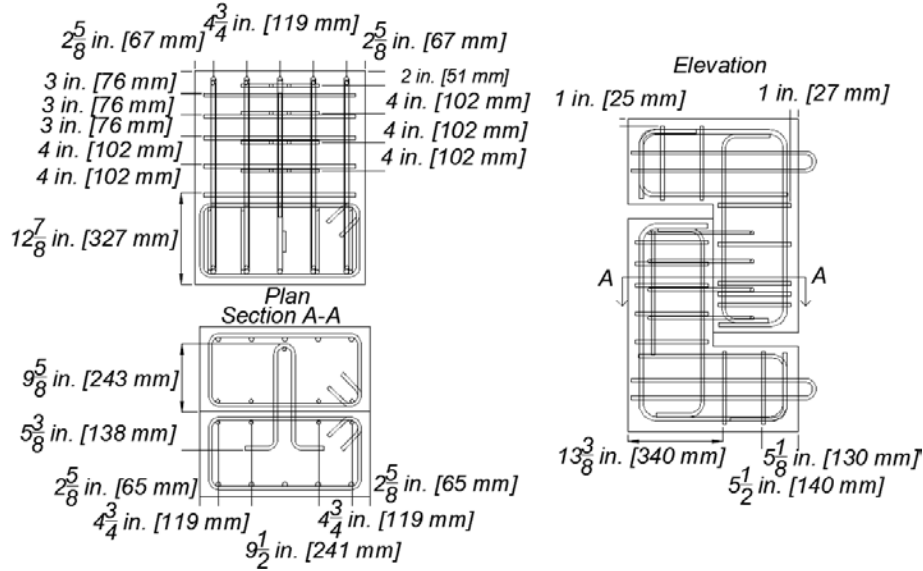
Reinforcing layout for specimens containing #4 (#13M) reinforcing bars
